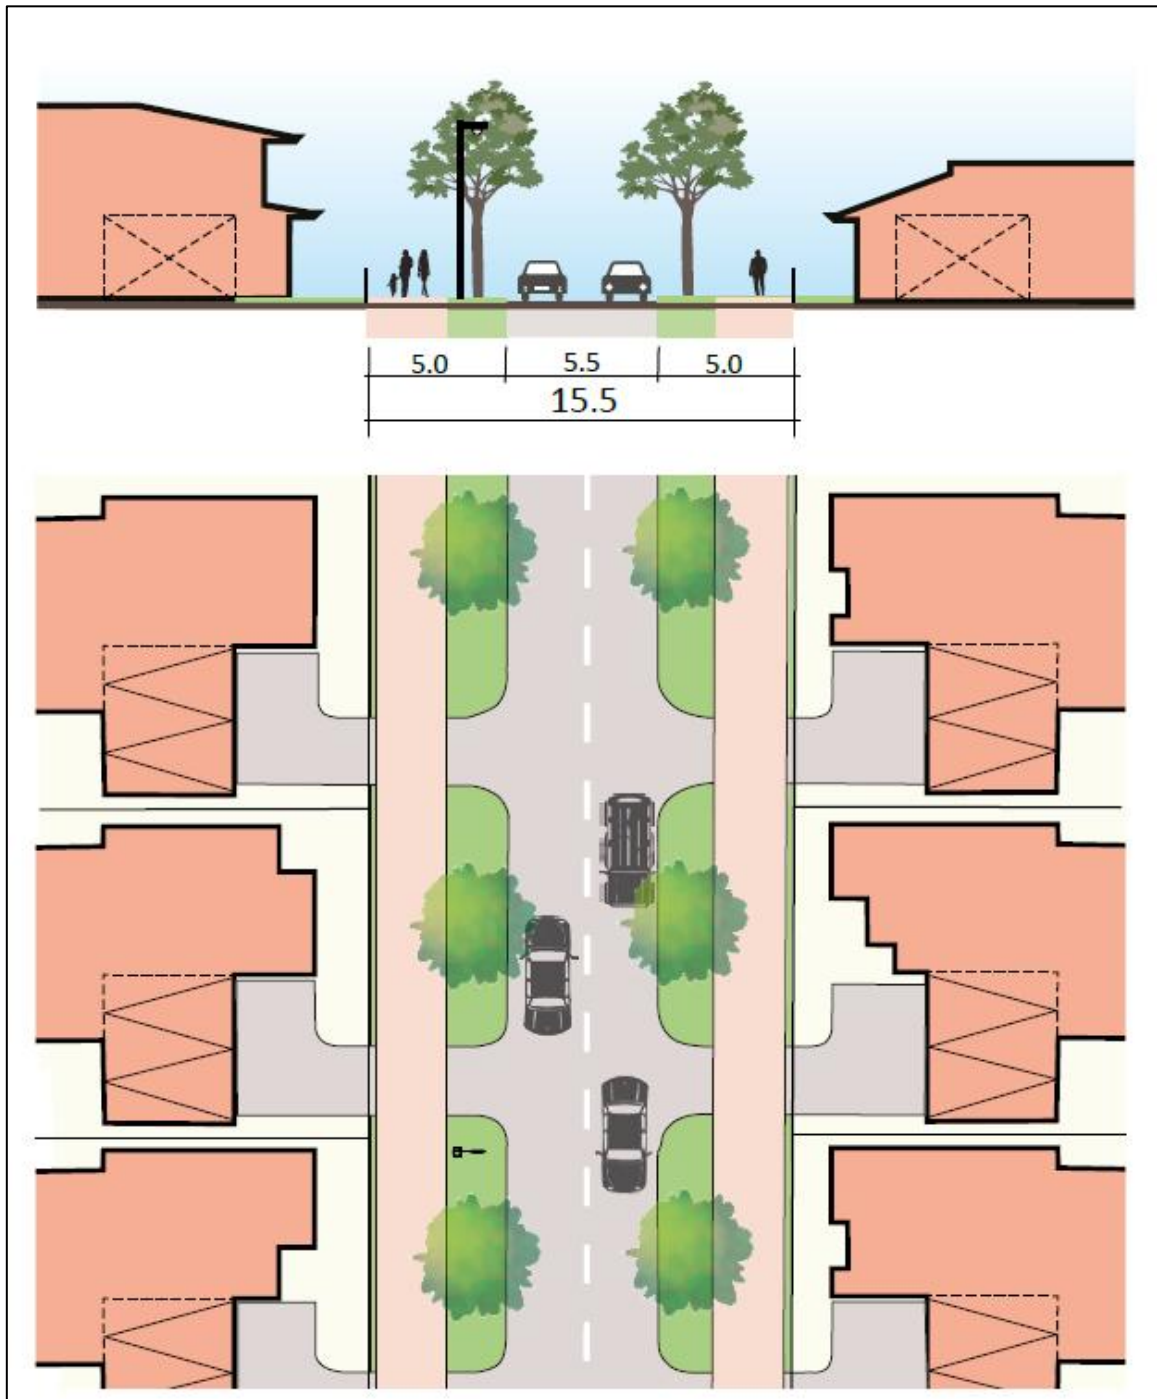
Typical cross section of Access Street D (source: Liveable Neighbourhoods 2015)
